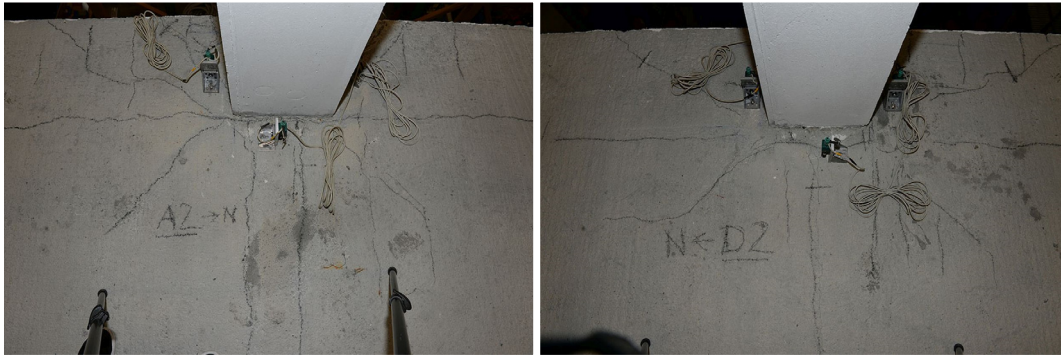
Damage in the slab-column connections, 2nd floor a) A2, b) D2.
